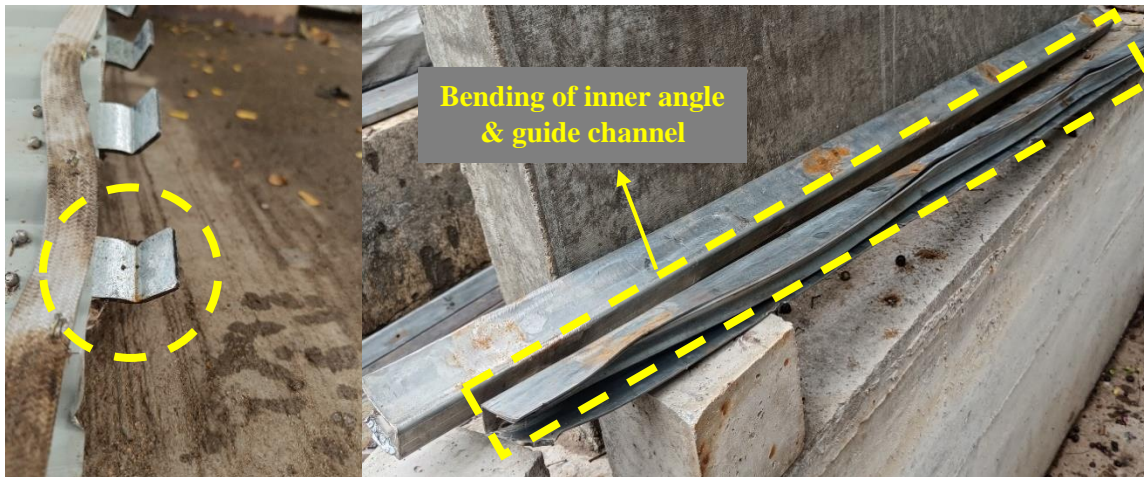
Bending of wind lock clips and followed by bending of inner angle with guide.
